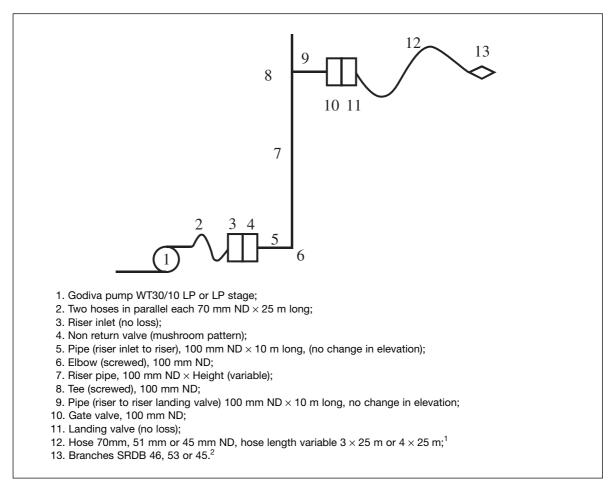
Schematic of installation dimensions and arrangements used for calculations
